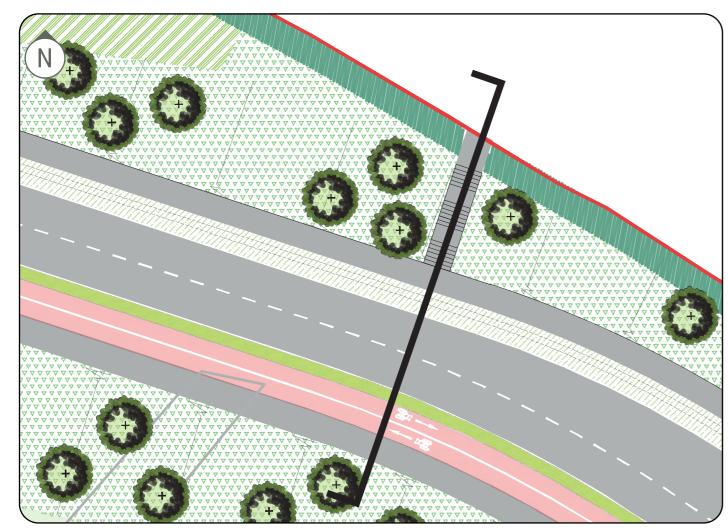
Plan Showing Proposed Pedestrian Steps Linking to Harp's GAA
